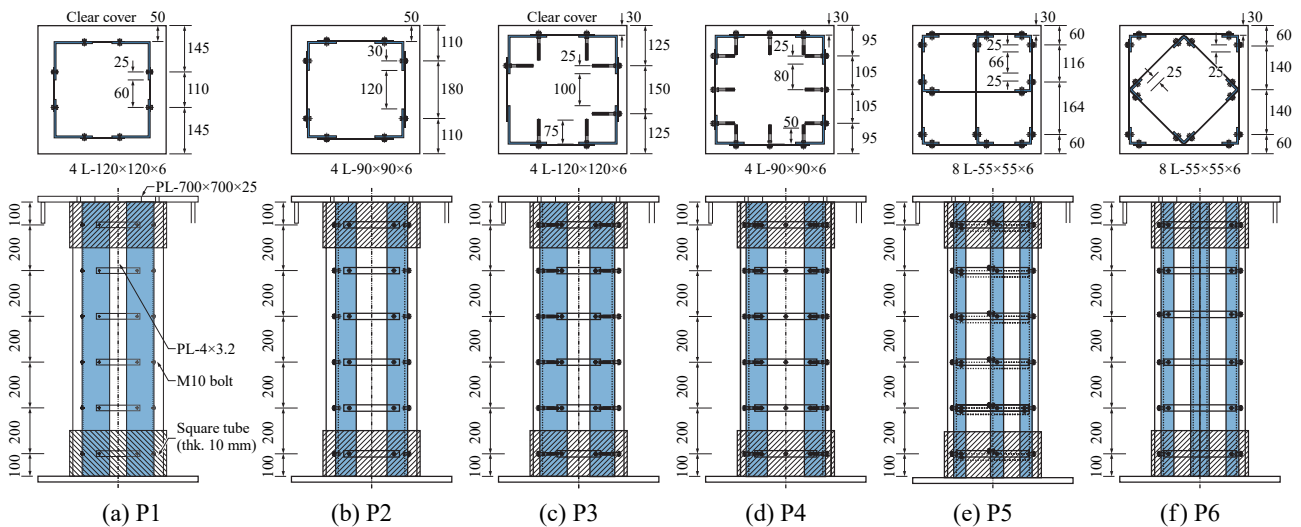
Reinforcement details of PSRC column specimens with longitudinal angles and transverse flat bars
